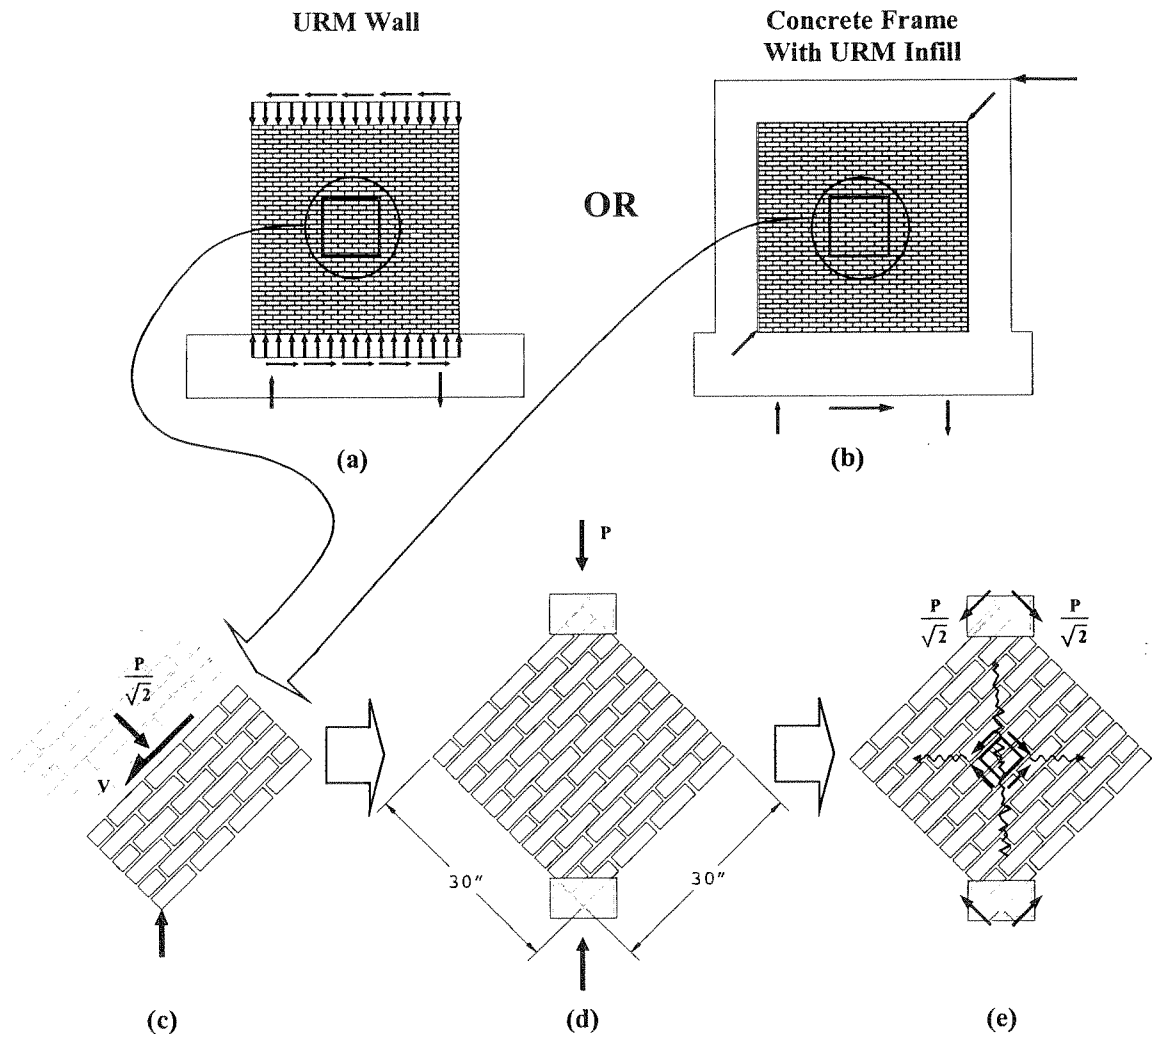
(a) URM wall. (b) Concrete frame with URM infill. (c) Equivalent free body diagram of the brick panel in the URM wall or URM infill prototypes. (d) Test setup. (e) Stress conditions at the center of the tested panel that induce vertical tension cracking.
